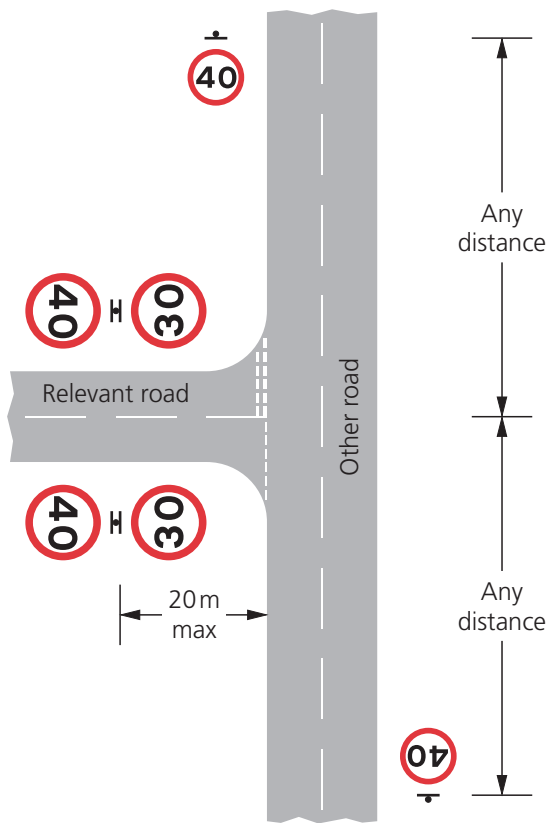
Full provision of terminal signs at a road junction where the side road (relevant road) has a lower speed limit than the major road
